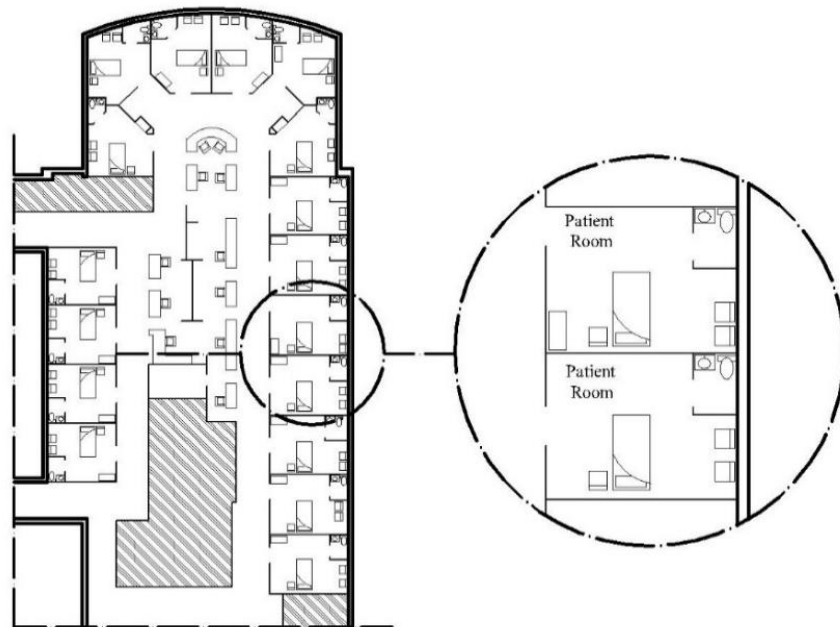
Floor plan of the same- handed room, South Florida Baptist, *ICU*, 2006¹⁷
